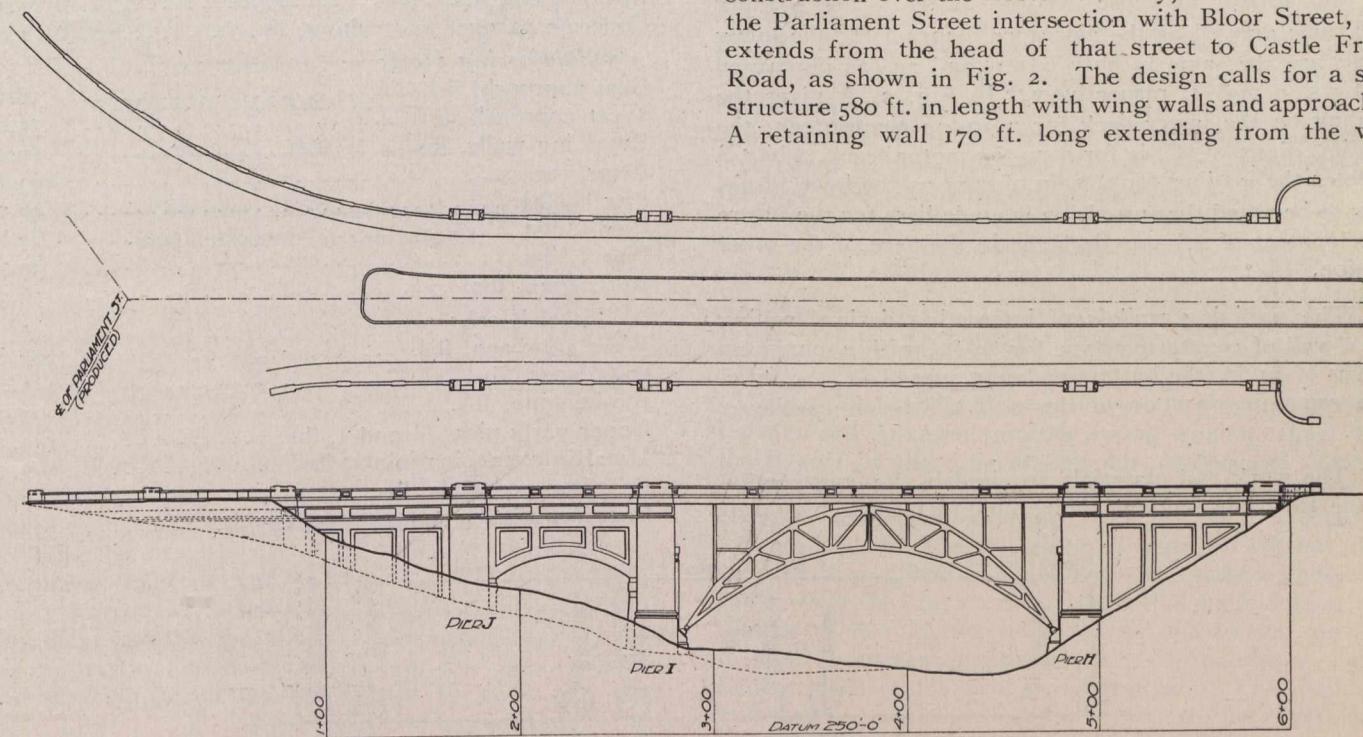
Plan and Elevation of the Proposed Rosedale Section of the Bloor Street Viaduct, Toronto.
